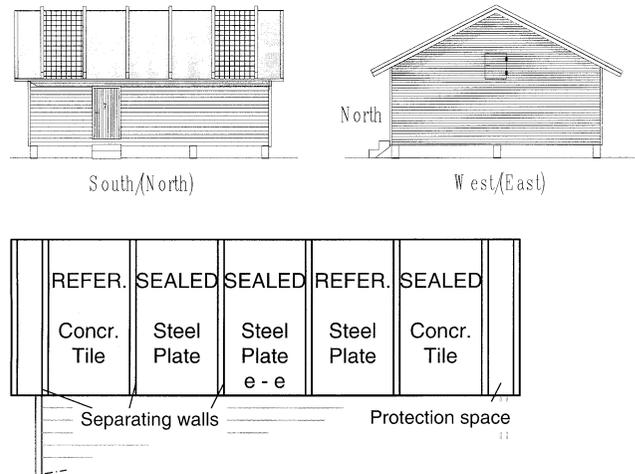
Roof test house at VTT test site in Espoo, in southern Finland (upper), and five different roof sections used in the experiments (lower). In the sealed roof section in the middle, there was only eaves-to-eaves ventilation (e-e).
